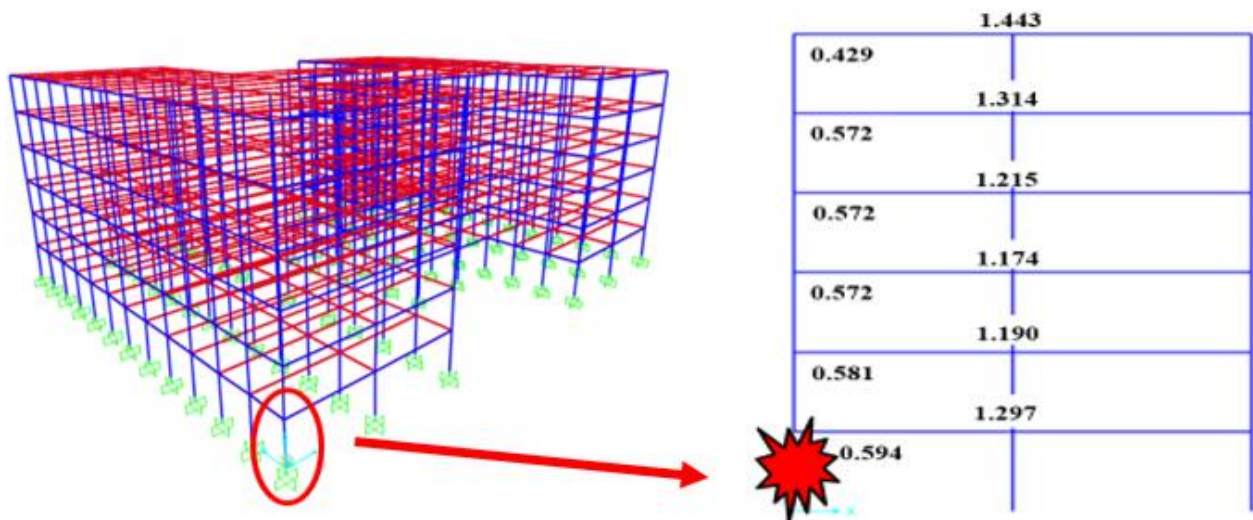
DCR of beam sections in X-Z plane after removing Corner Column C159 (case 3)
